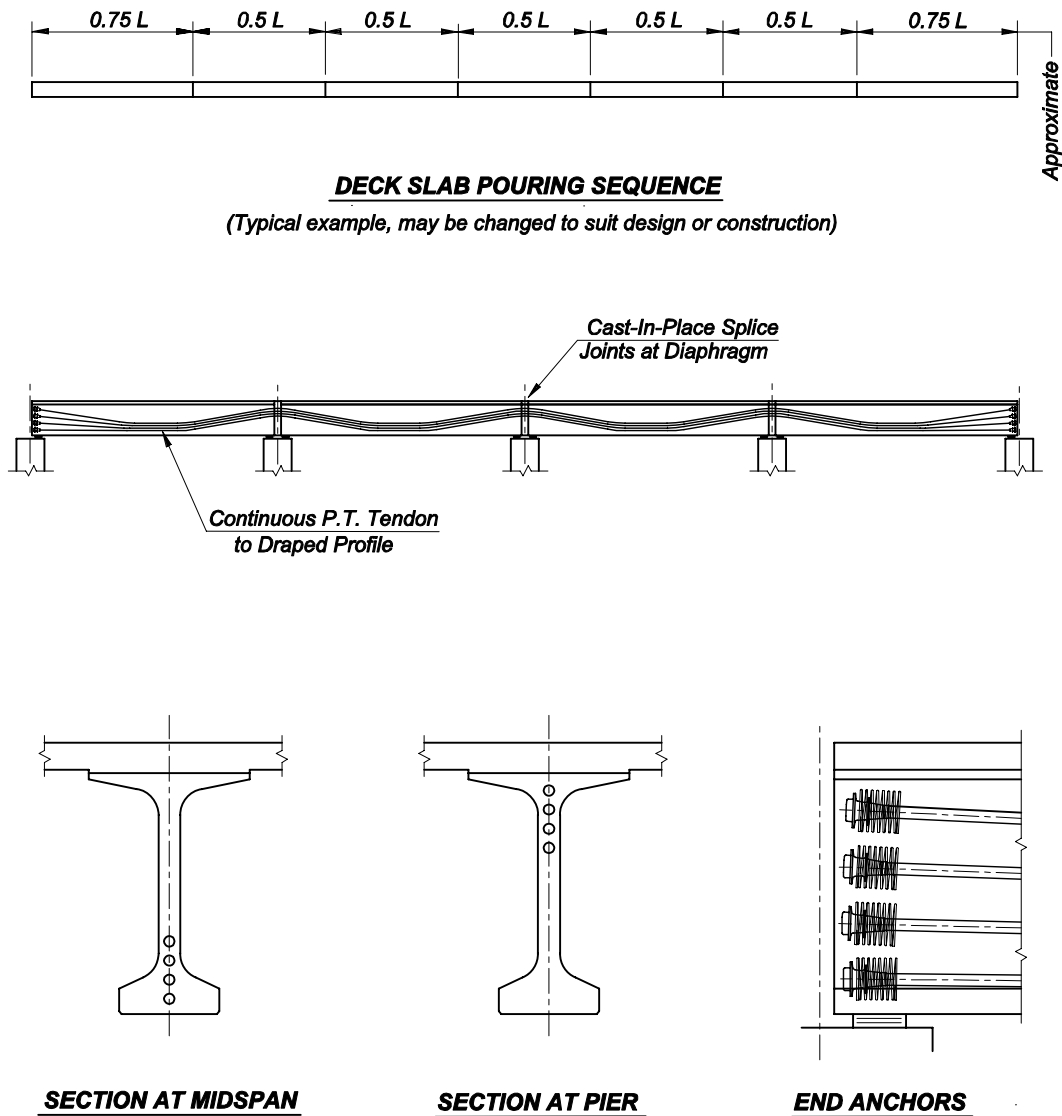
Post-Tensioning for 4-Span Spliced Girder
